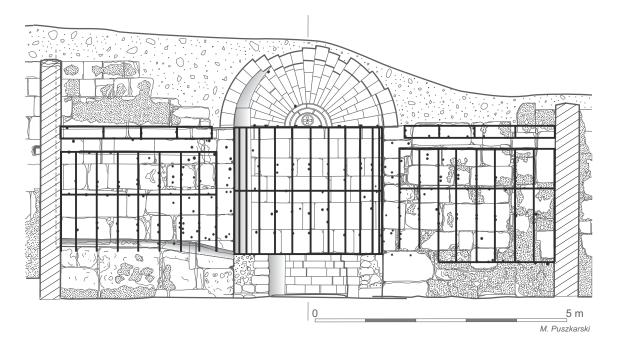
Reconstruction of the layout of marble wall revetment on the east wall of the basilica based on distribution of clamp holes
